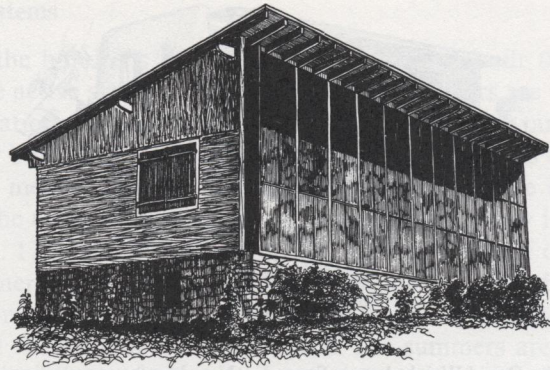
Trombe-Michel house, developed for use in the south of France, with a massive concrete south-facing wall used as the heat absorber, insulated by double glazing, with convection space provided between the concrete and the glazing. The vertical south wall provides both heat storage and heating of the building at night.
